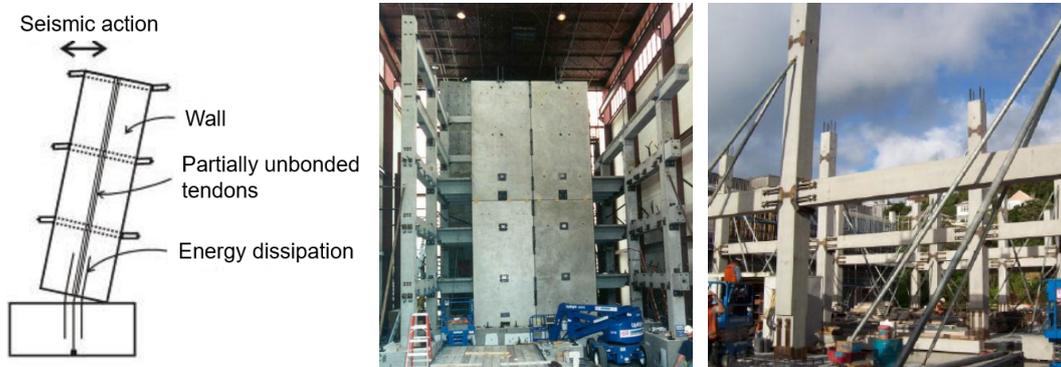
Left: concept of low-damage system (fib 2003); Centre: five-storey PRESSS Building tested at University of San Diego (Priestley *et al.*, 1999) Right: First multi-storey PRESSS-Building in New Zealand (Structural Engineers: Dunning Thornton Consultants; Cattanach and Pampanin, 2008).
